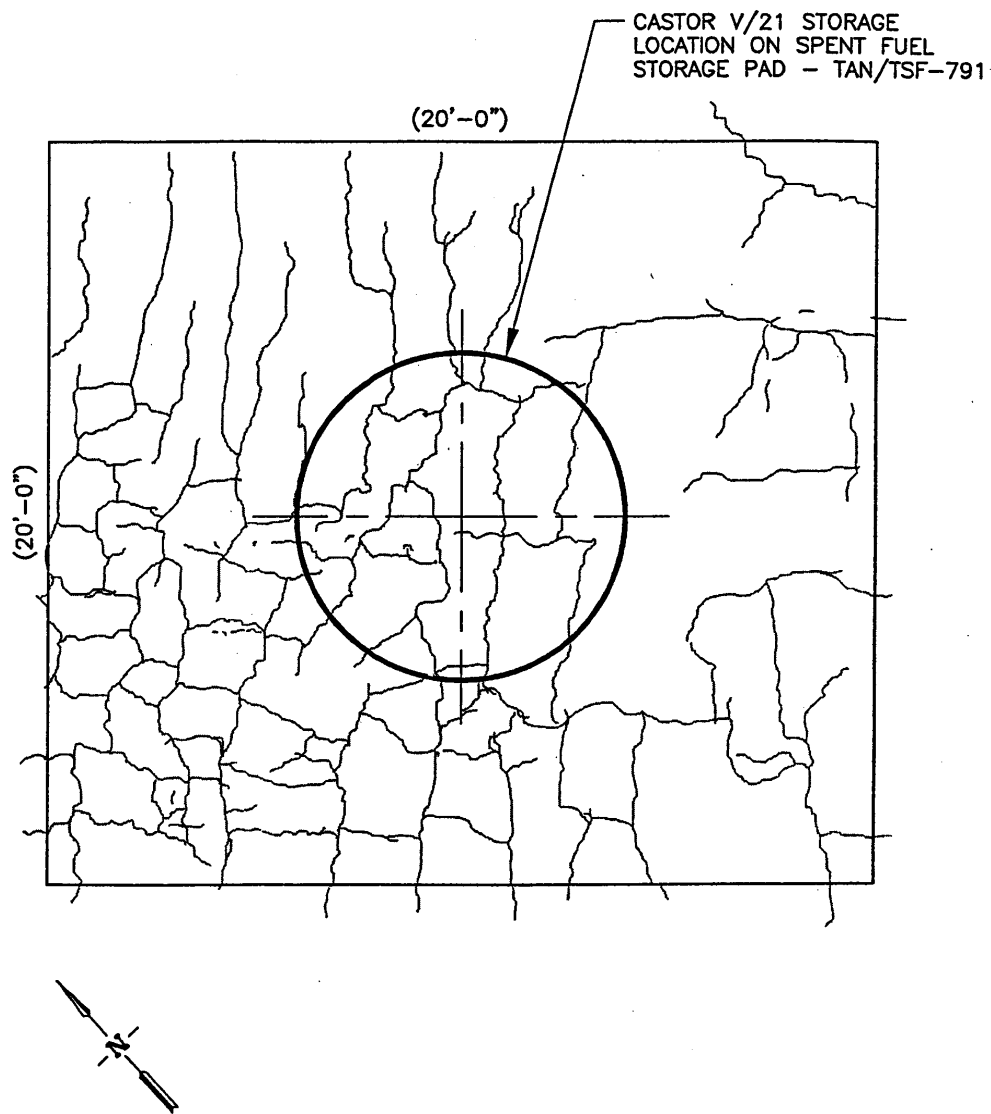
Shrink crack indication of CASTOR V/21 concrete pad storage area.
